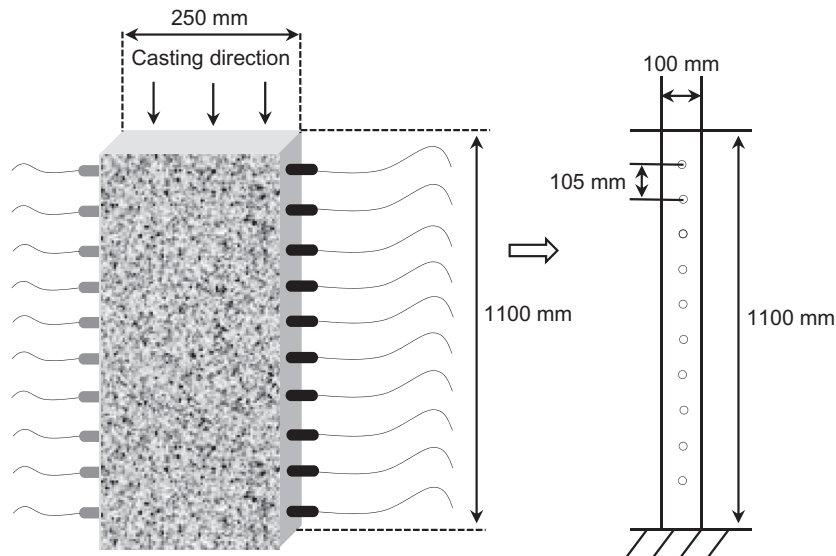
High size concrete member location of the PVC steel bars and concrete casting direction [30].
